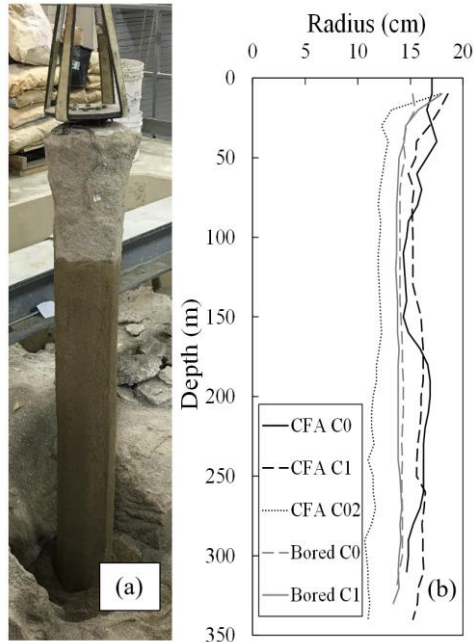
Pile profile, (a) pile extraction, (b) cross section
